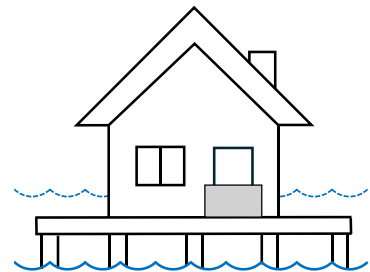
Example Building Conversion to Wet Floodproofing with Open/Closed Foundation.
